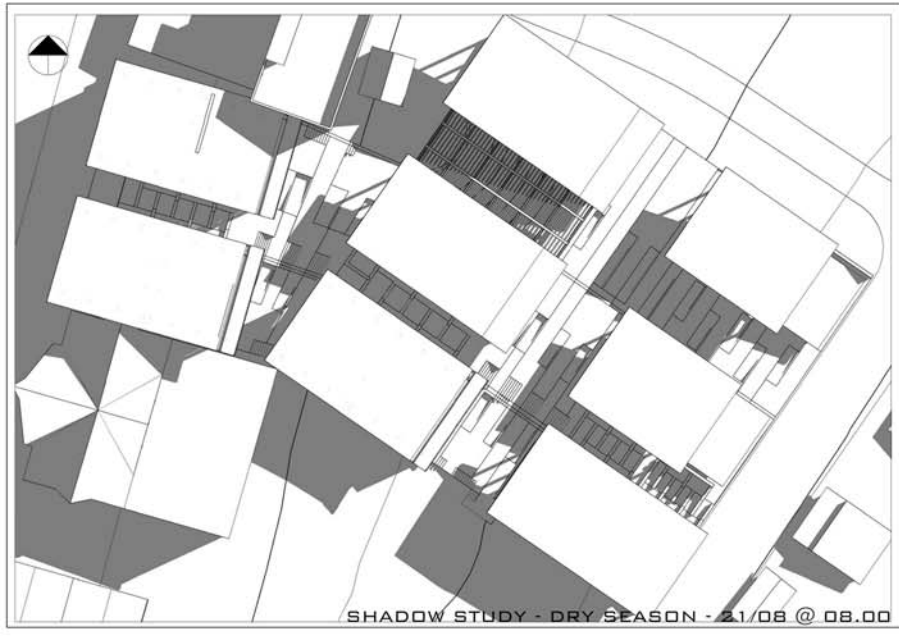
SHADOW STUDY ON 21 AUGUST AT 08.00 - SITE PLAN (AUTHOR, 2006).
